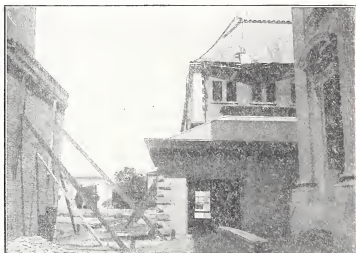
Rear View, Hall of Records, San José, Showing How the Heavy Stone Outer Walls Cracked Away from the Interior Framing Due to Improper Anchoring of Walls to Floors and Roof.
